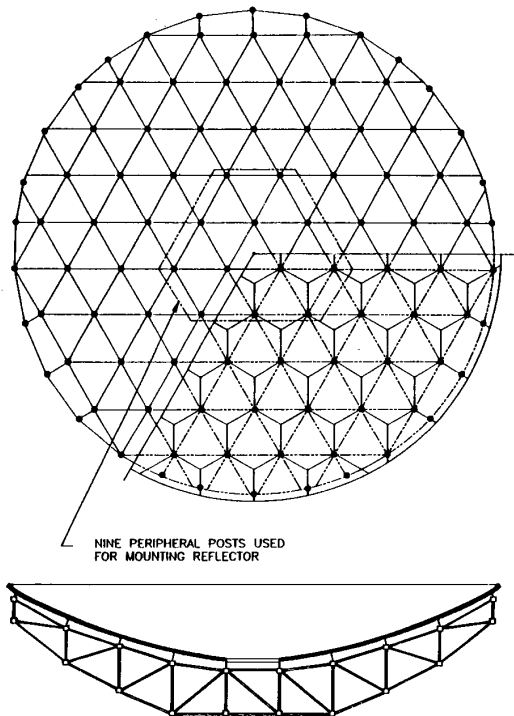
Plan view and cross section of the spaceframe backing structure and panels.
